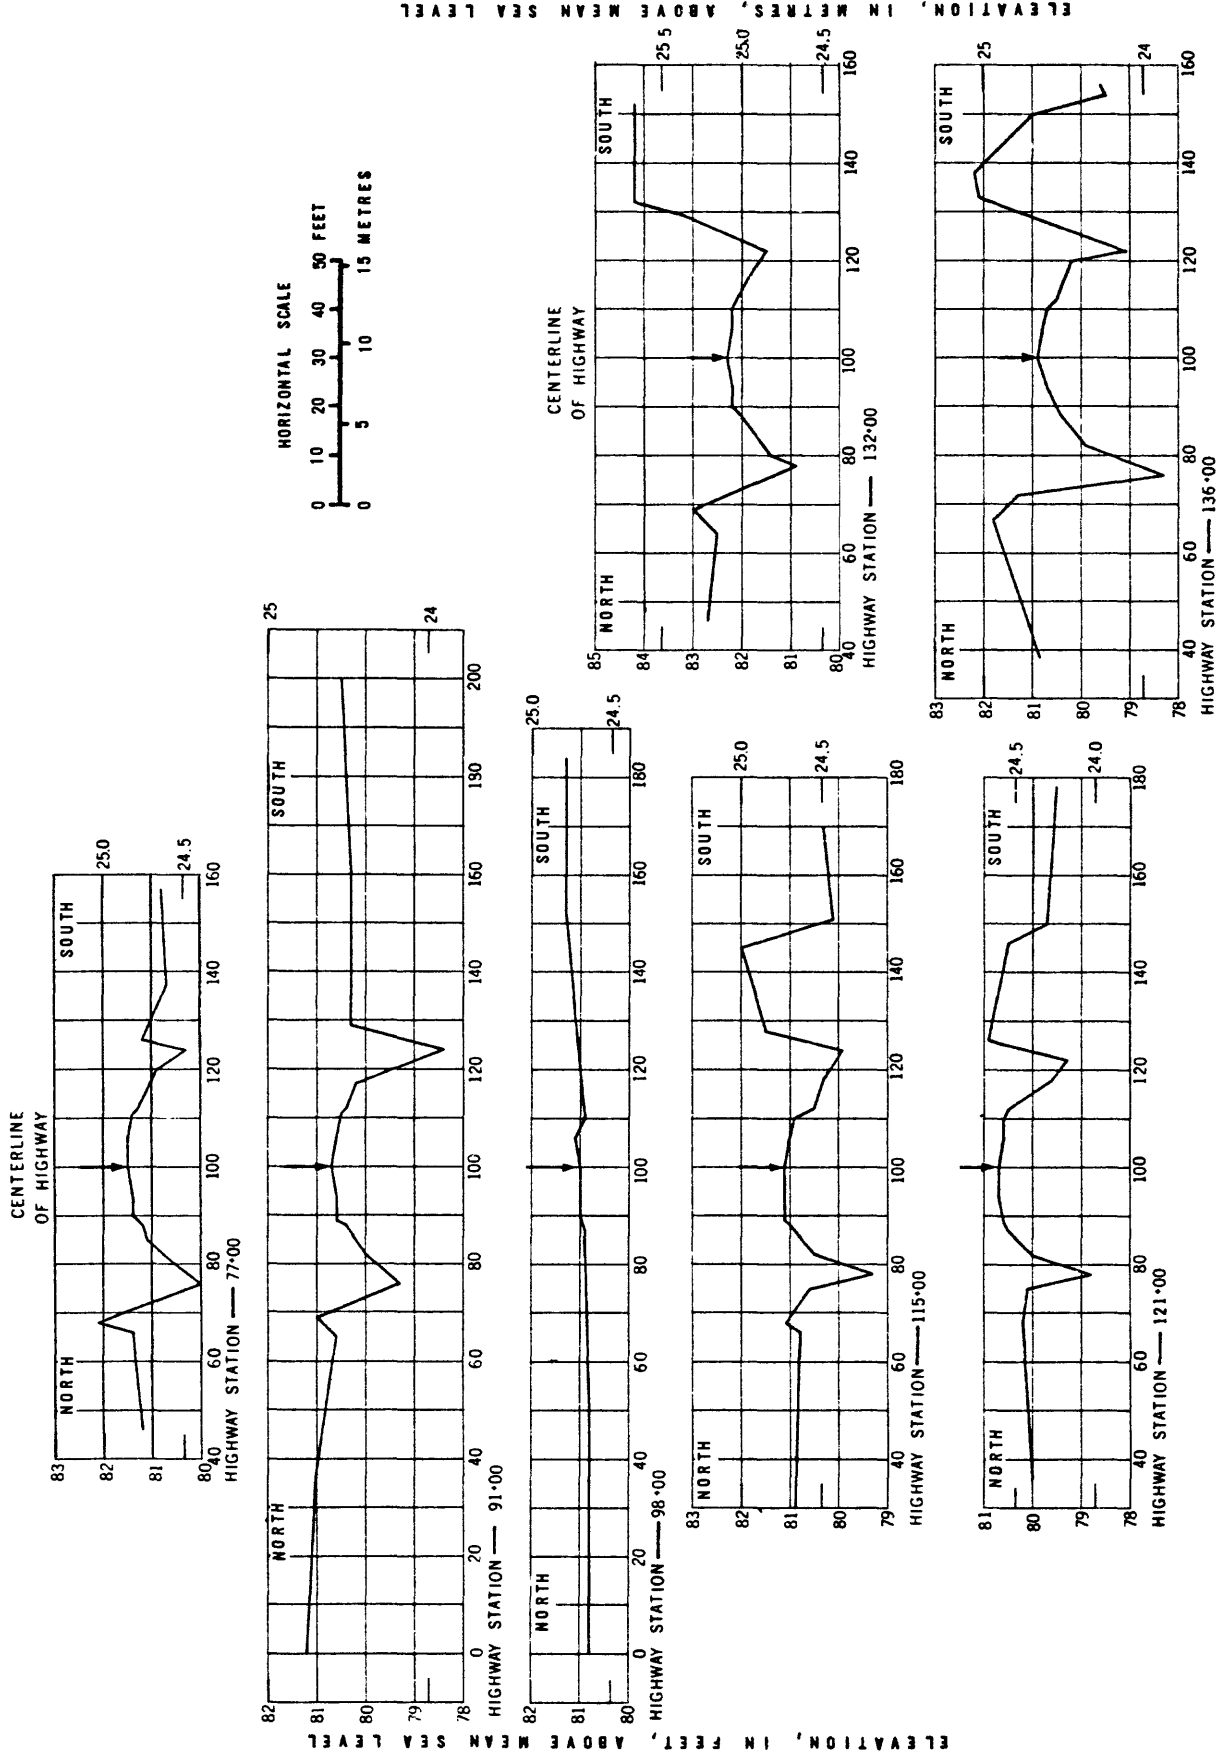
Cross sections of State Highway 162 roadway embankment.
